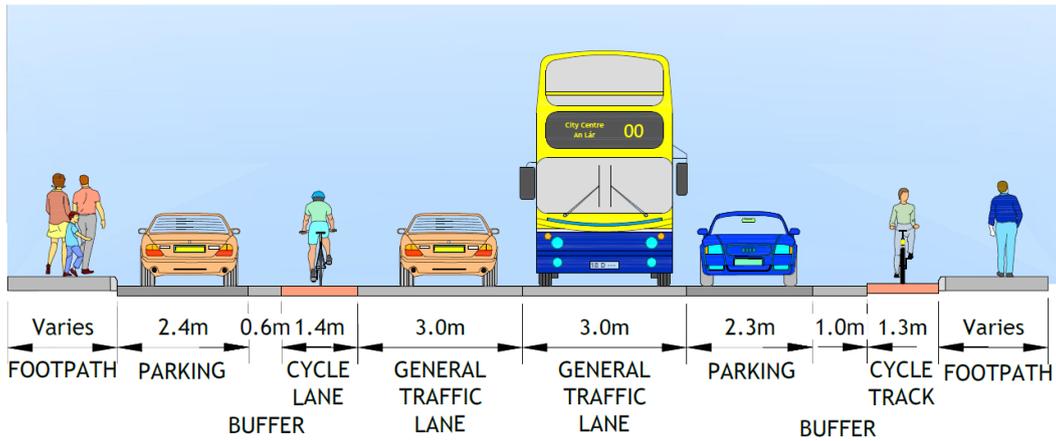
Cross-Section B-B (Relevant to TG2 and TG3)
